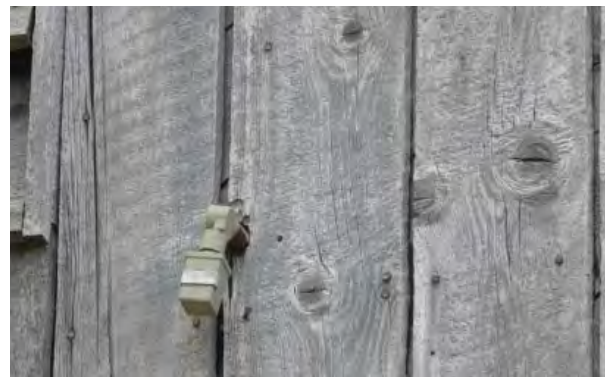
Typical shrinkage cracks, note diagonal sheathing visible between boards.
